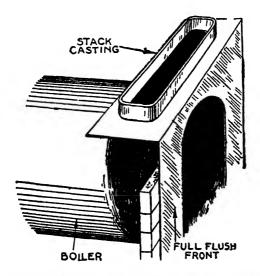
,408.—Stack plate casting for flush end boiler, full flush front. The smoke box is formed by the brickwork of the setting.
